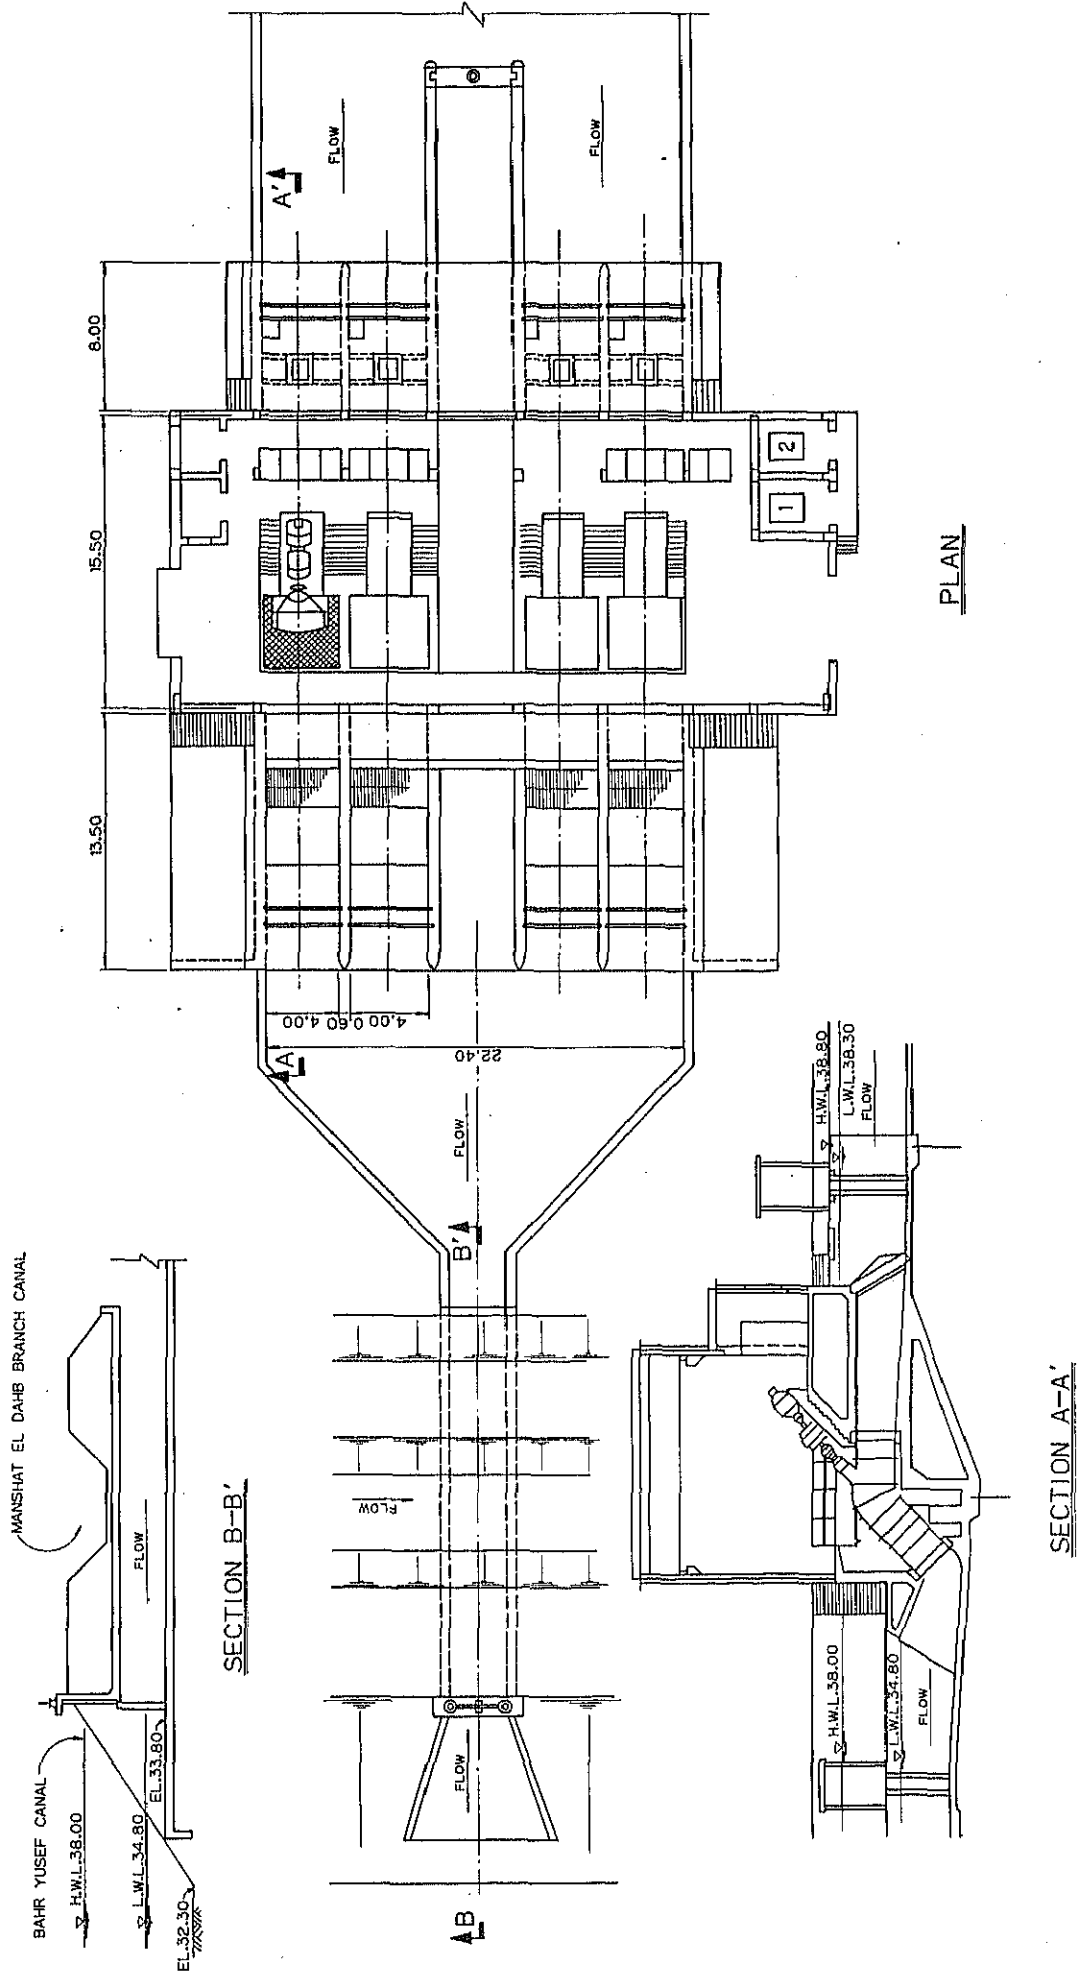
Proposed Plan of Kamadir No.5 Irrigation Pump Station
